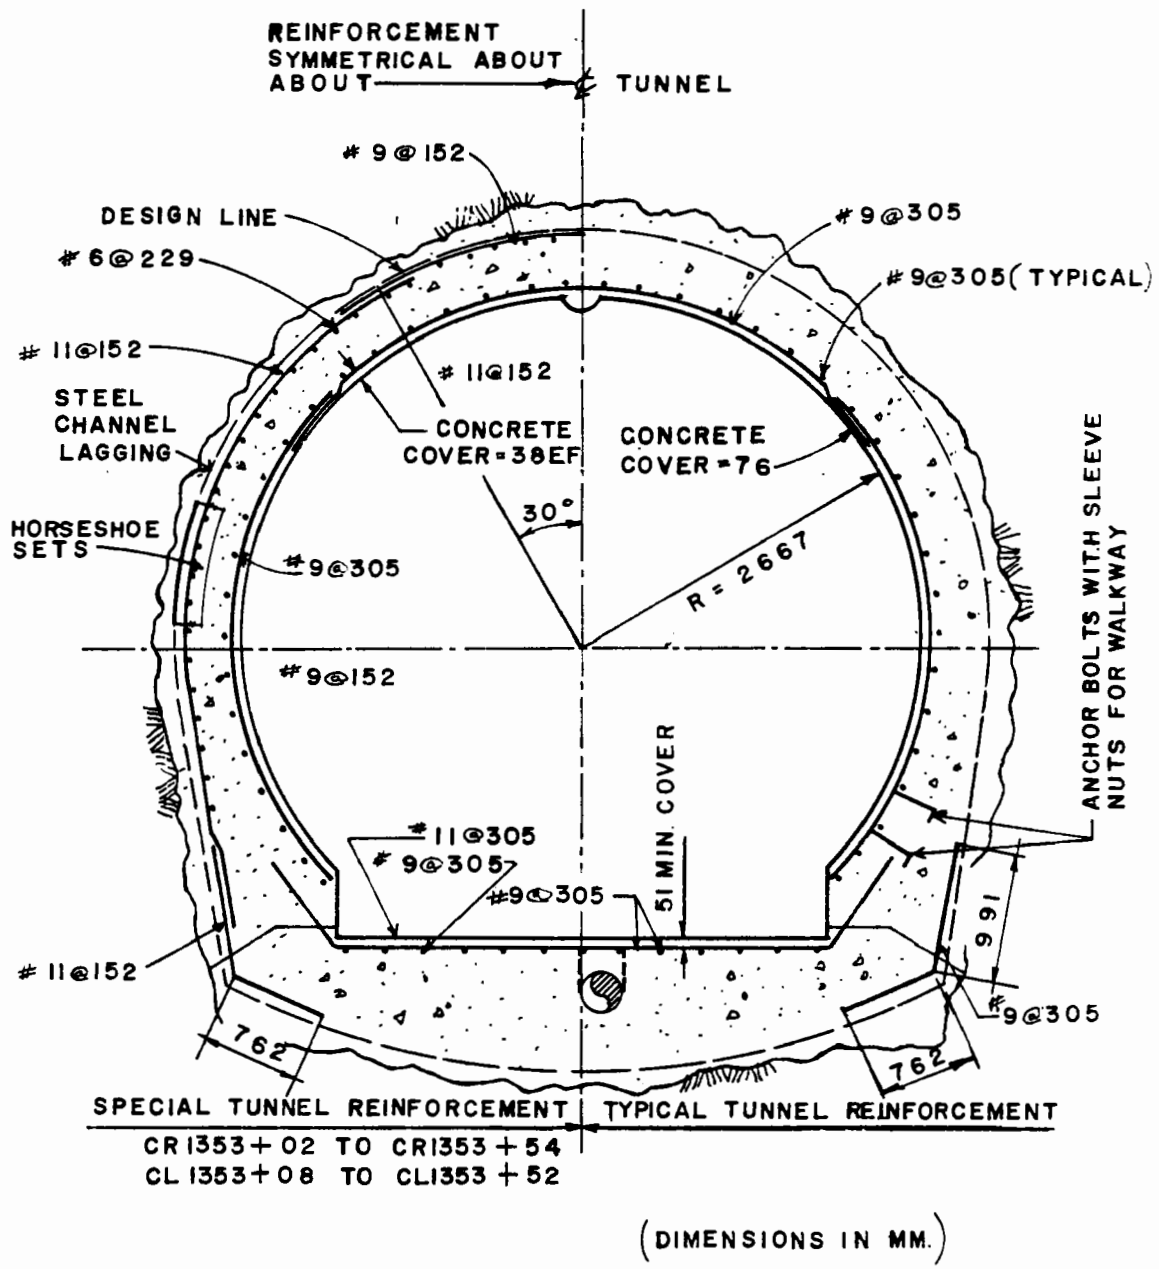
BART Berkeley Hills Tunnels, concrete liner reinforcement.
